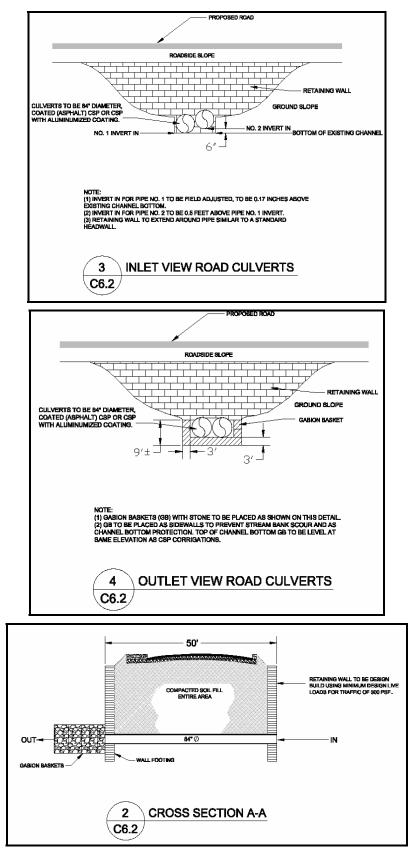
5: Road crossing detail of main tributary, culverts reduced to 78"
